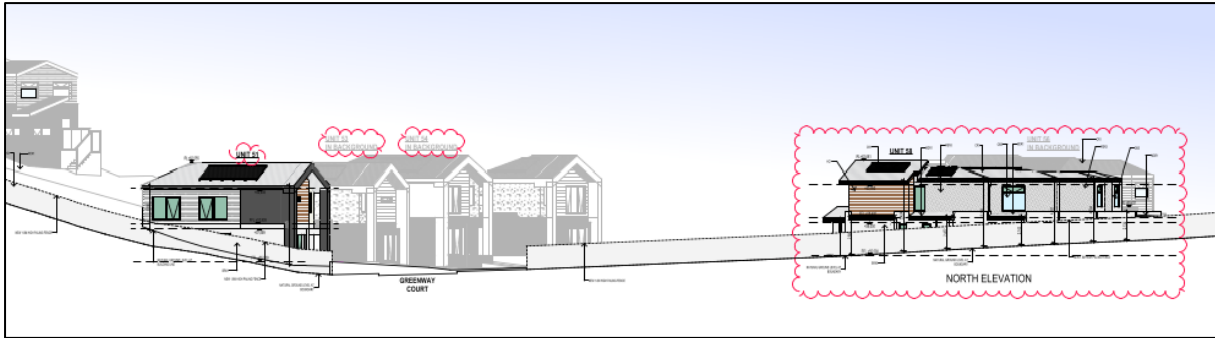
(above): Proposed north site elevation showing the entrance to the site from Greenway Court. Source: Application document.
